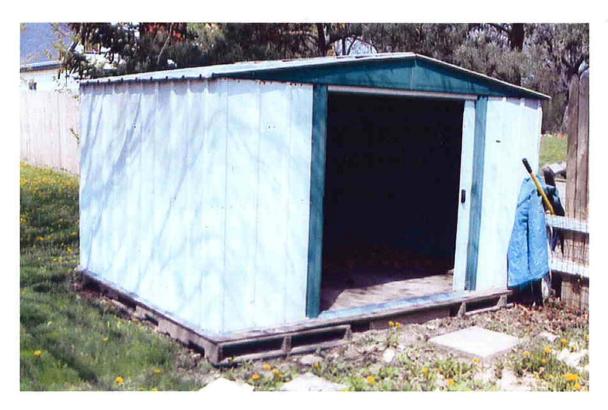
View of the steel shed (Structure #19) at 42834 N. Kenosha Road, looking northwest.
